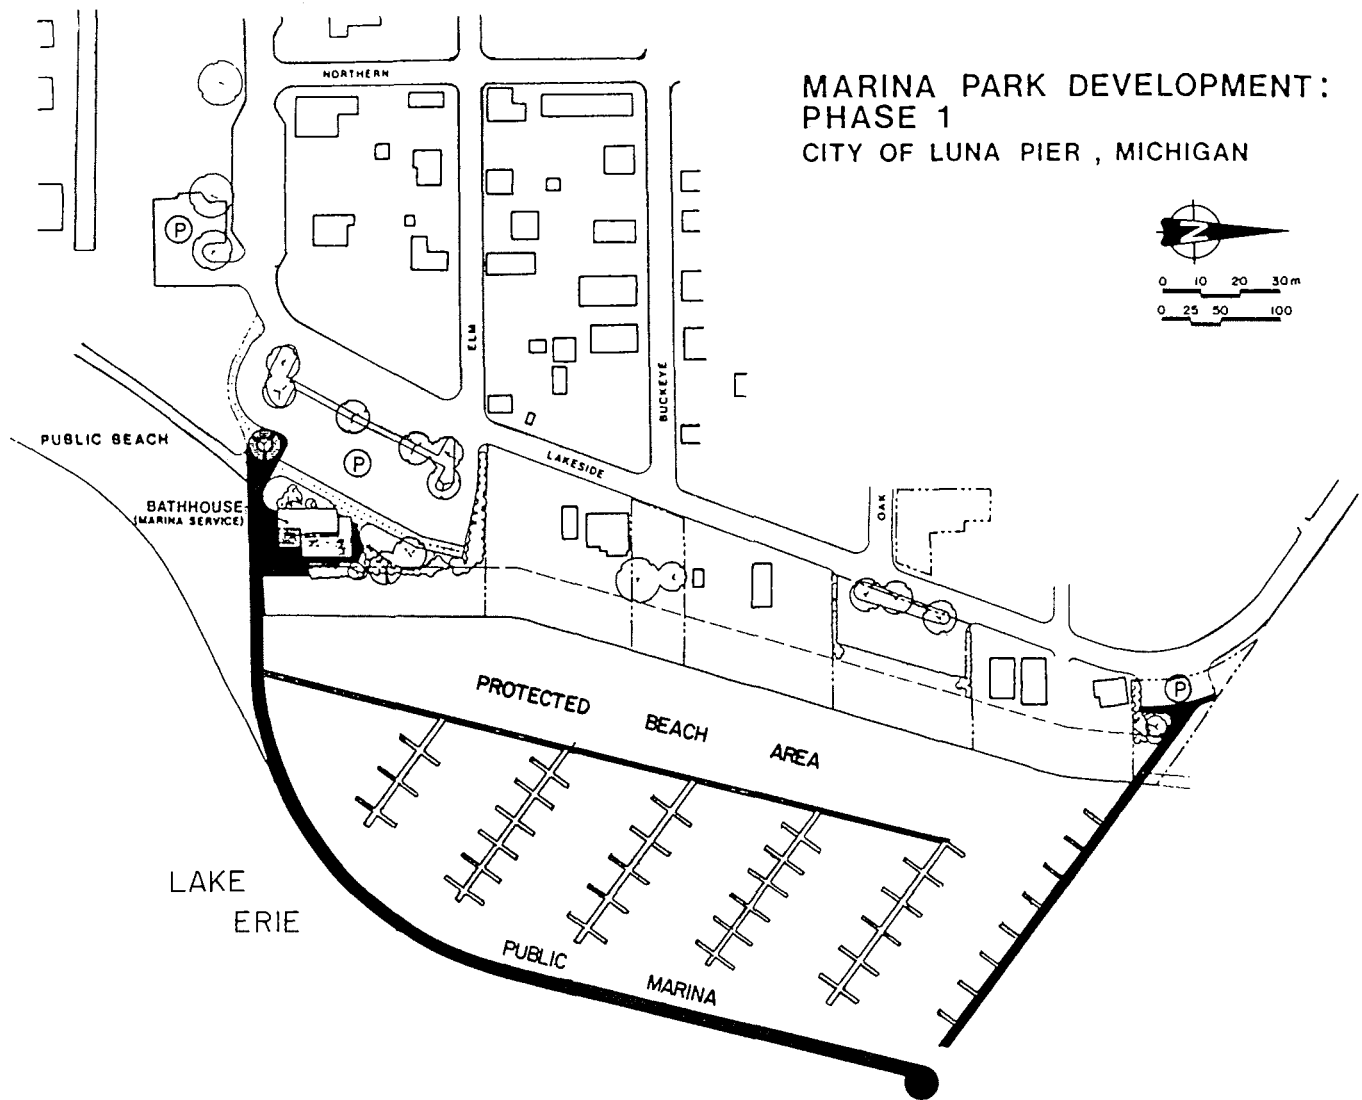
Plan view of proposed marina and public beach area for City of Luna Pier.
